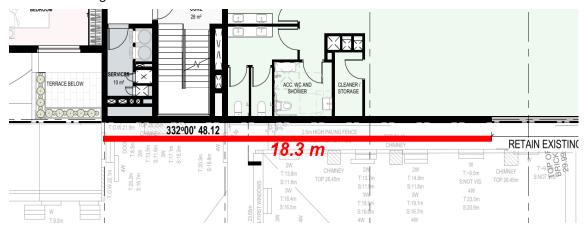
Screenshot of first floor wall on boundary, as advertised. Source: Source: TP.1101 Advertised plans, Cera Stribley.
